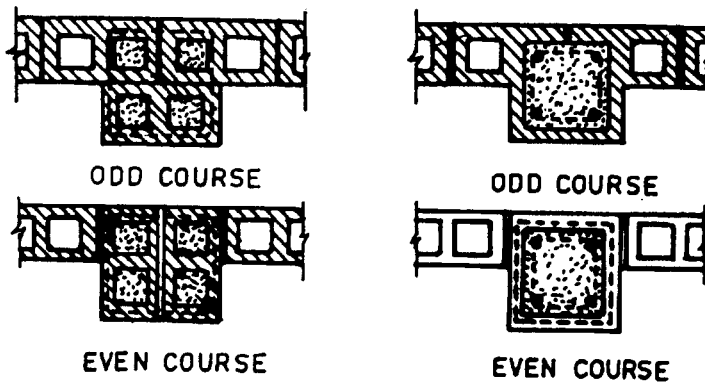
CONSTRUCTION OF CONCRETE BLOCK MASONRY
